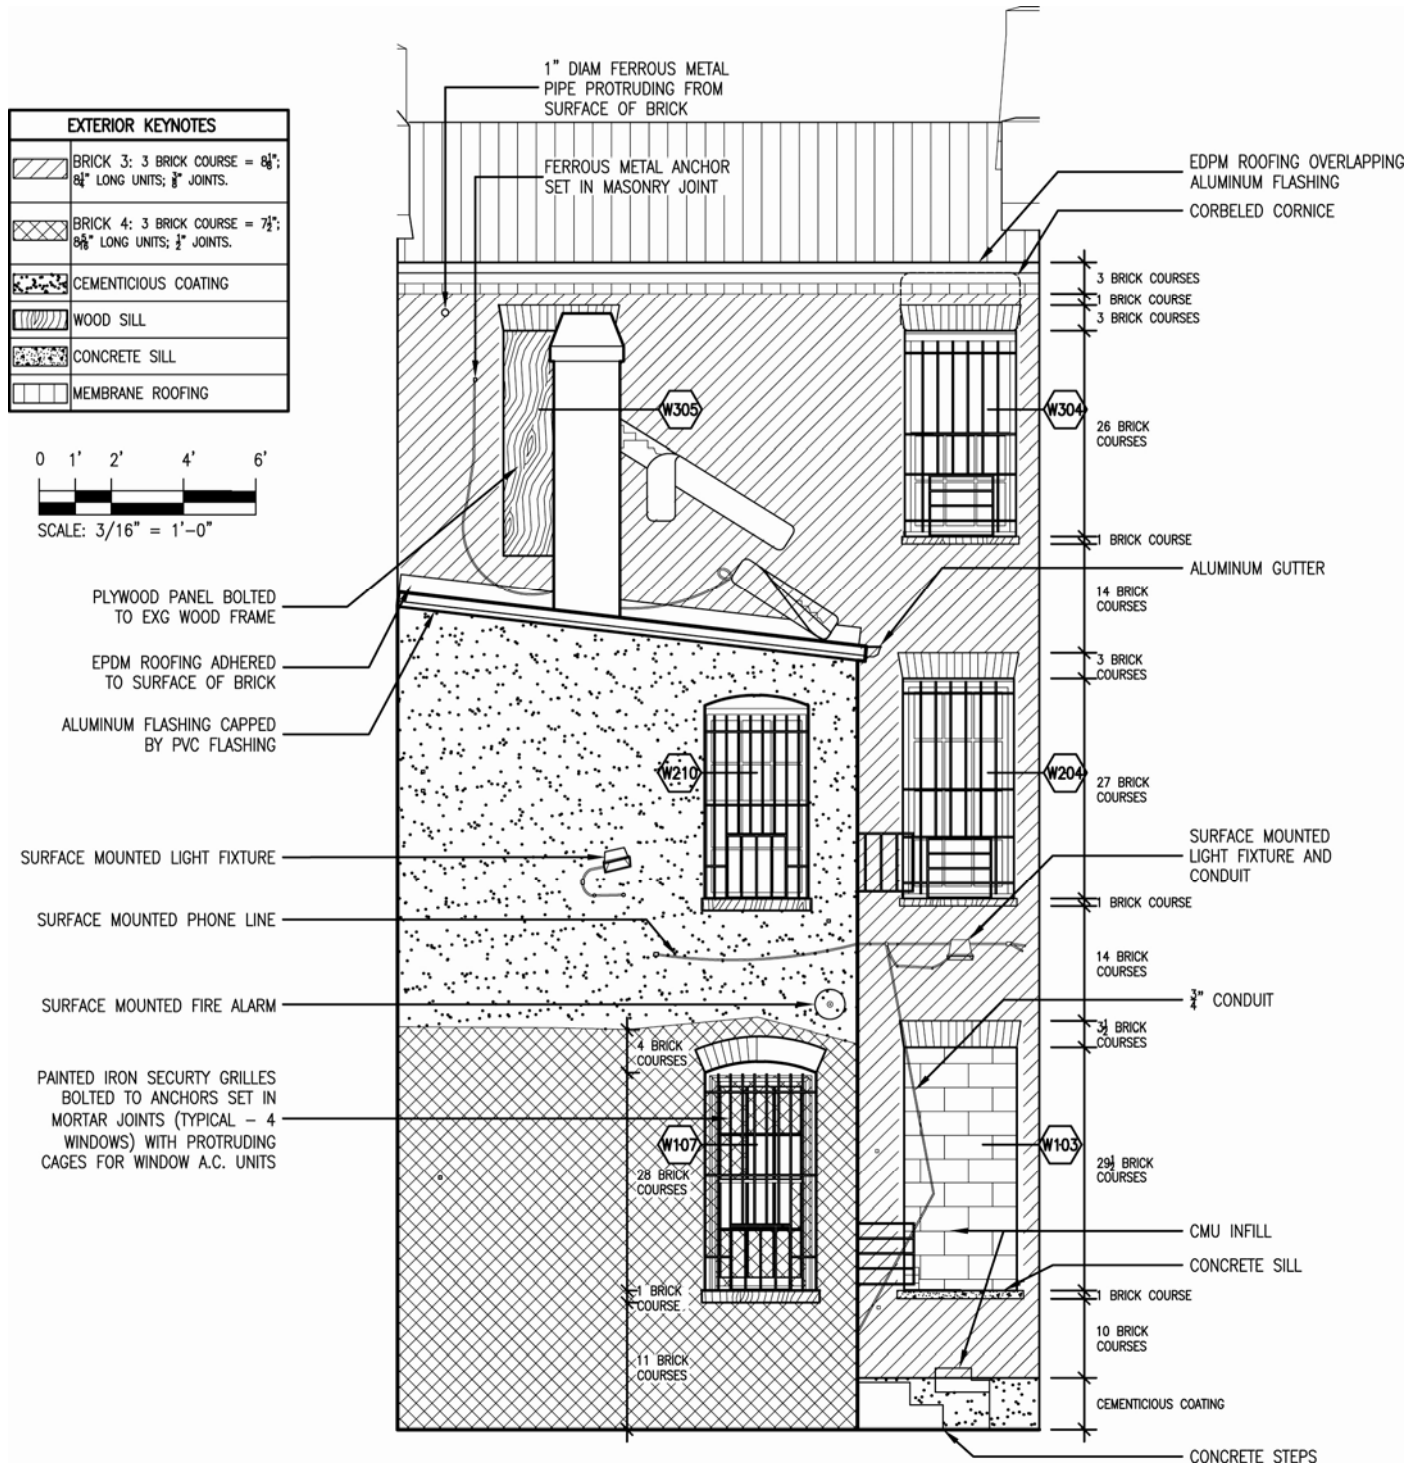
West Elevation – Inventory of Exterior Character Defining Features, Spaces and Elements
